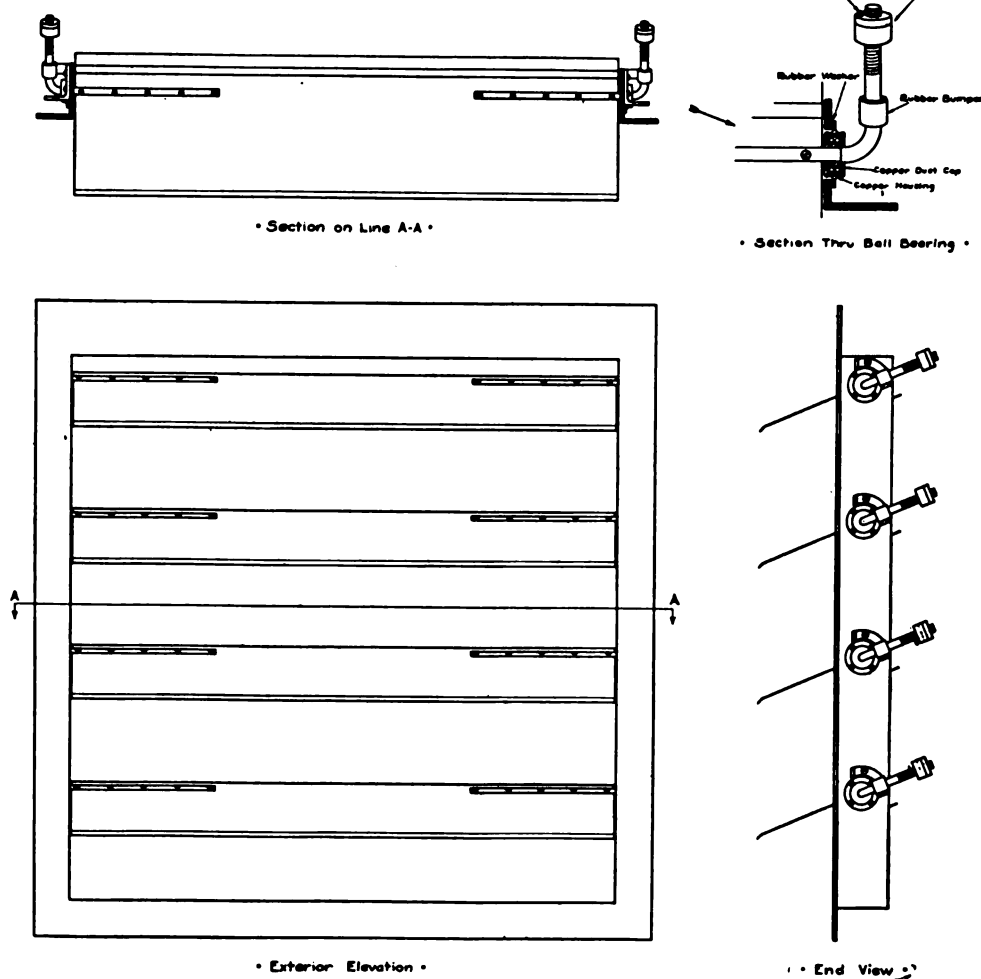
BALL BEARING TYPE VENTILATOR OR BACK-DRAFT DAMPER
